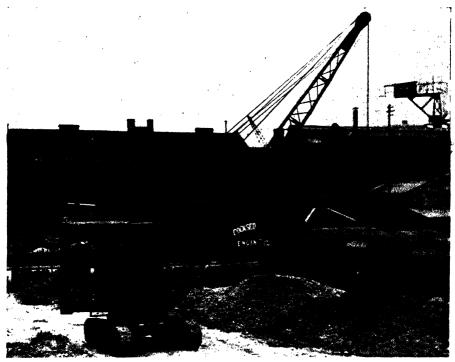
EQUIPMENT WORKING WITH GRAB BUCKET
